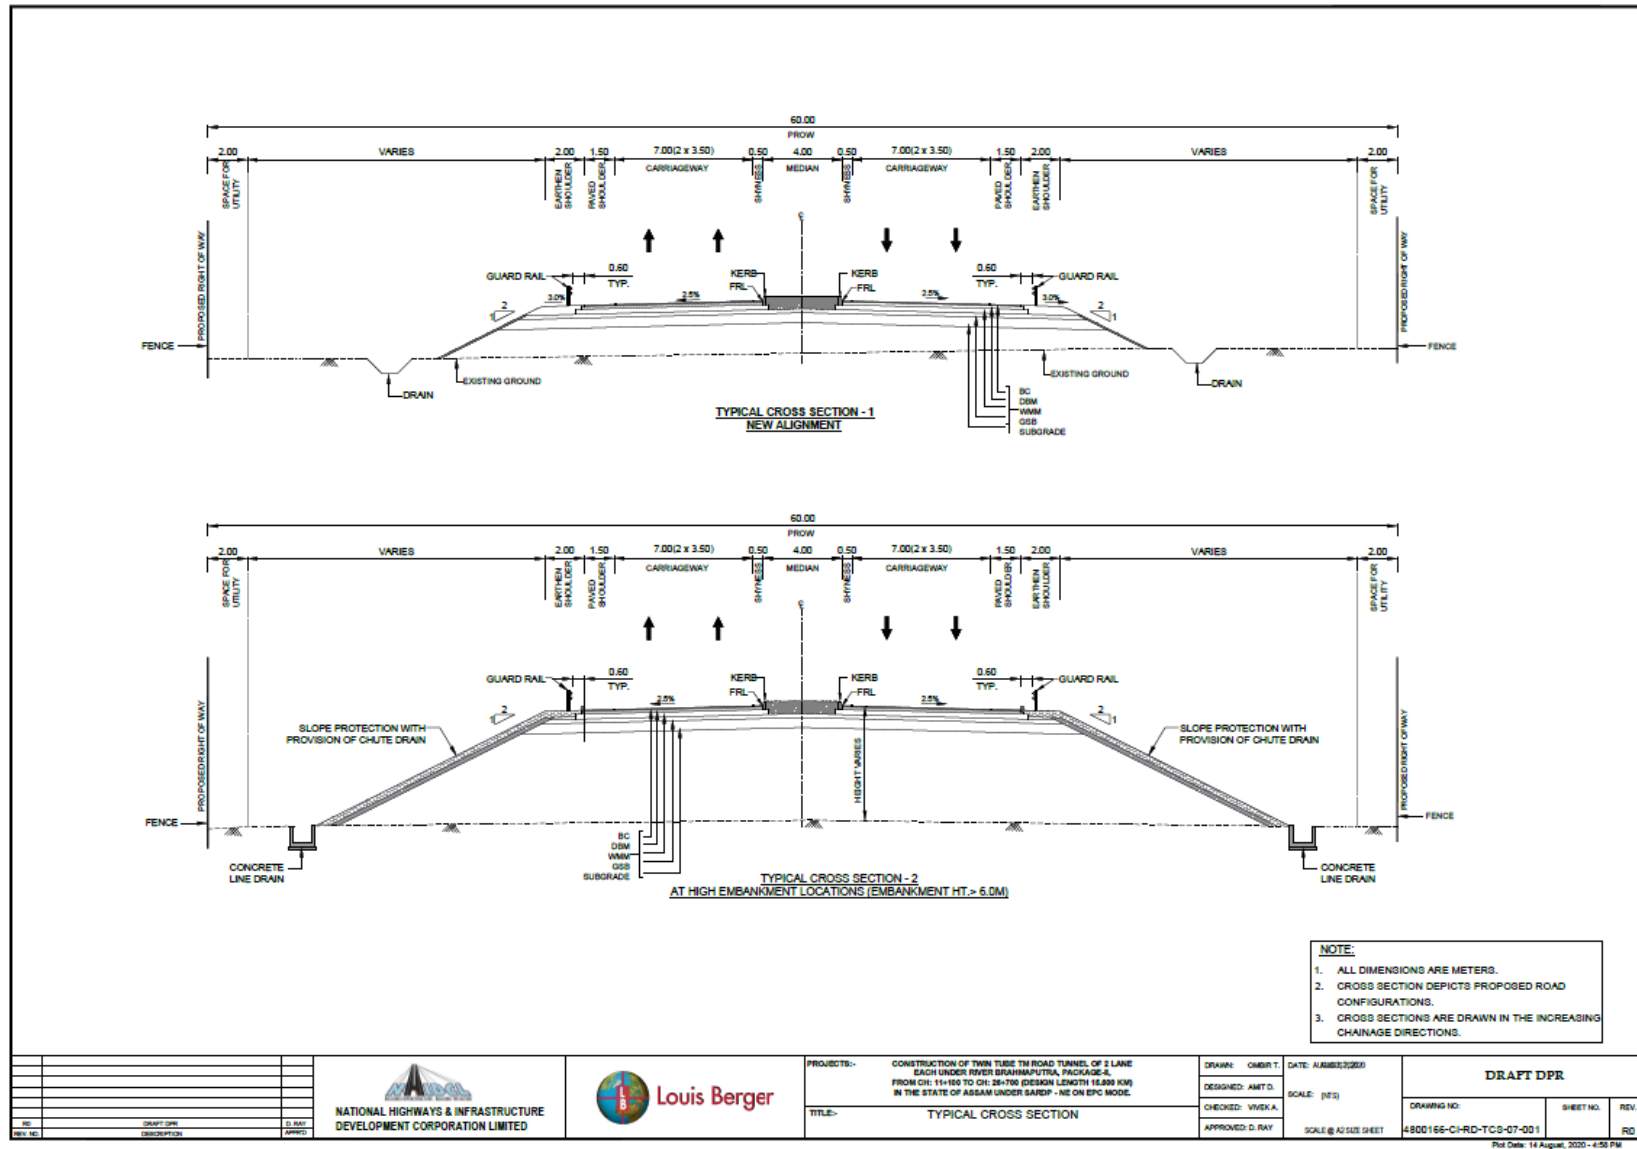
Typical Cross-section of Proposed Alignment & at High Embankment Locations (Embankment Ht. > 60 m)
